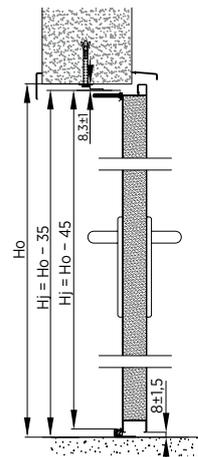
Installation of the single-leaf door with a wrap-around frame in a masonry wall, vertical cross-section
